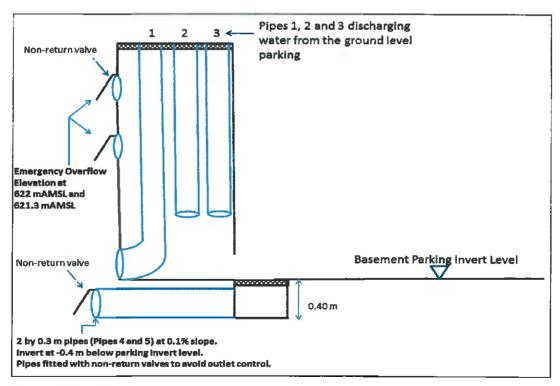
Conceptual Long Section Schematic of the Basement Level Sump, Catch Pit and Stormwater Diversion Pipes.
